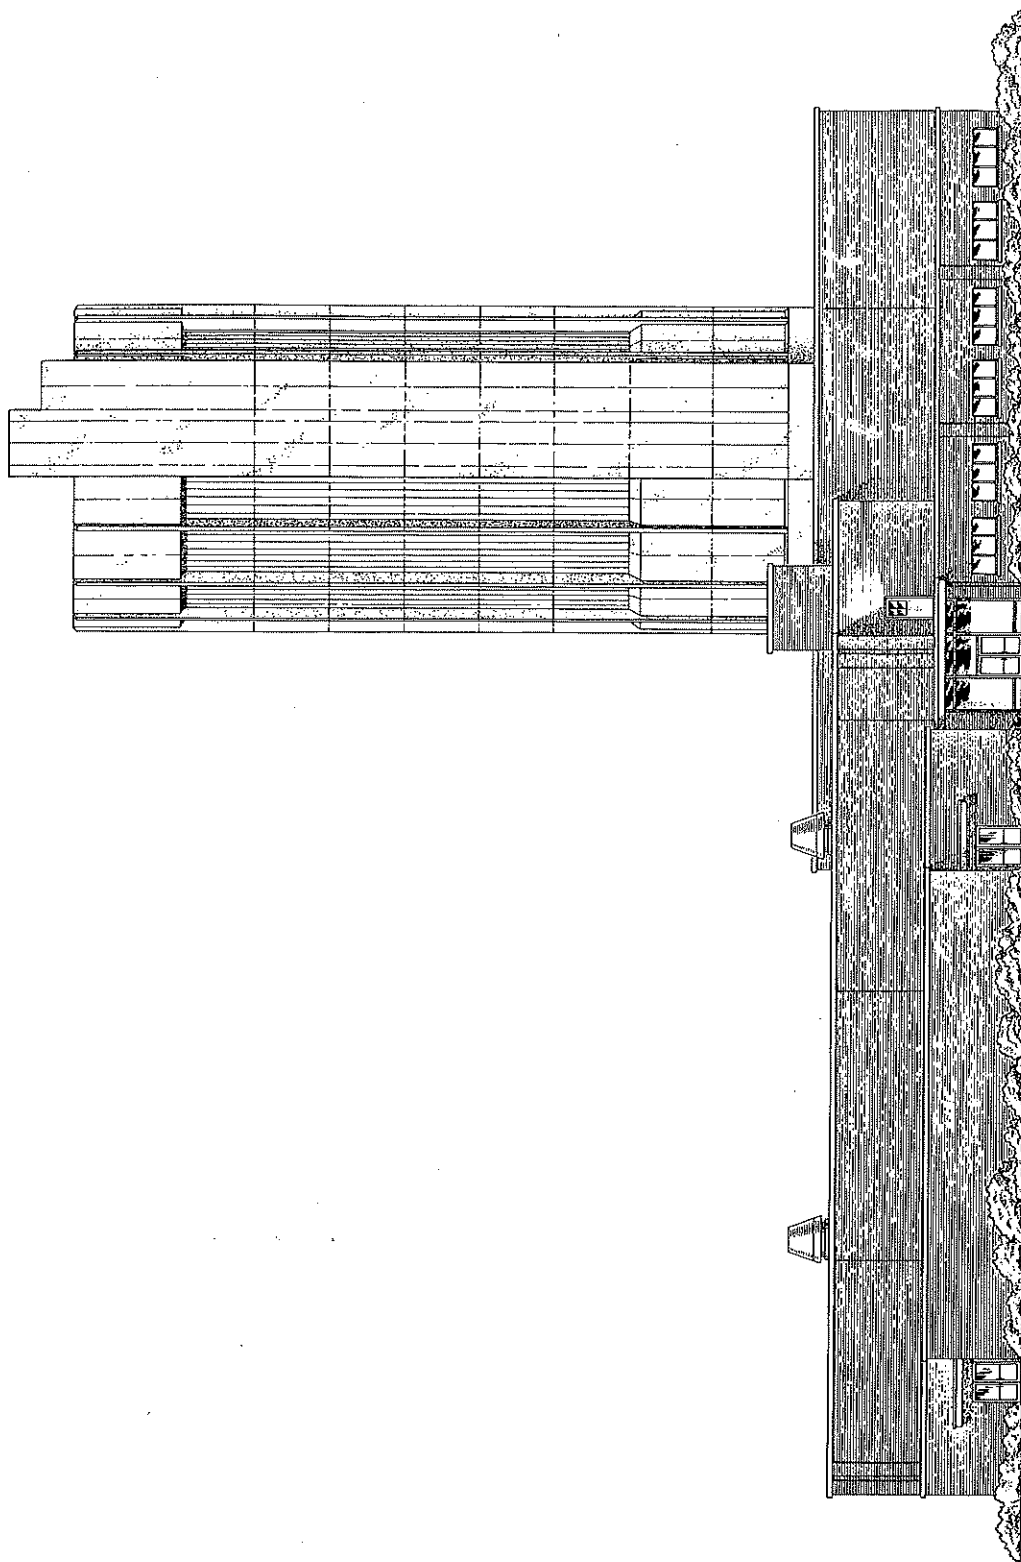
Elevation view showing one proposed treatment of accelerator tower.
